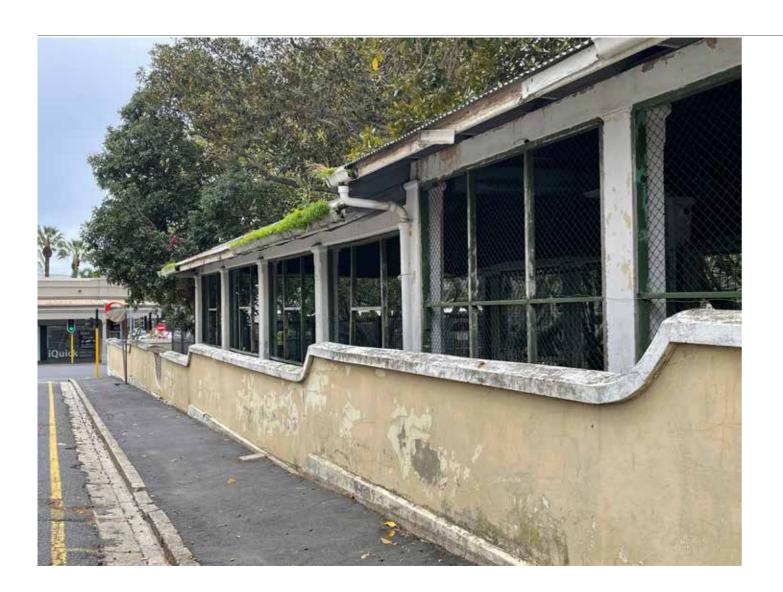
Site boundary walls, The Glen Road. (RSA 2023)
